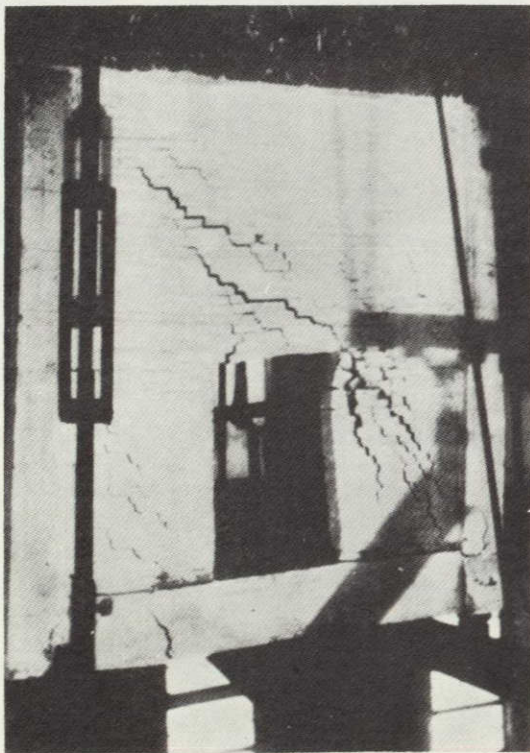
Brick wall without Rahmen structure, load added to the point of breaking.
